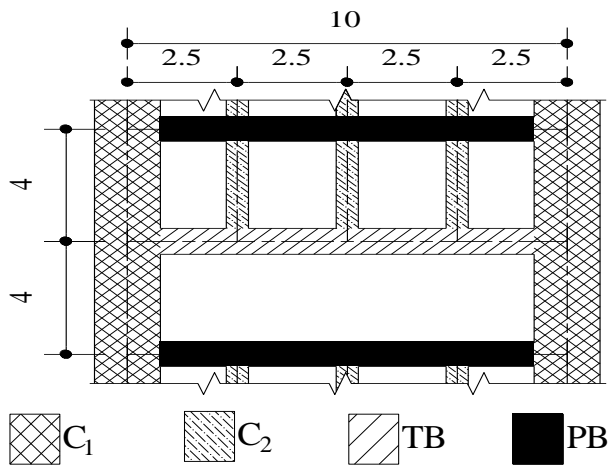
Position of Transfer Girder (All Dimensions Are in M).
